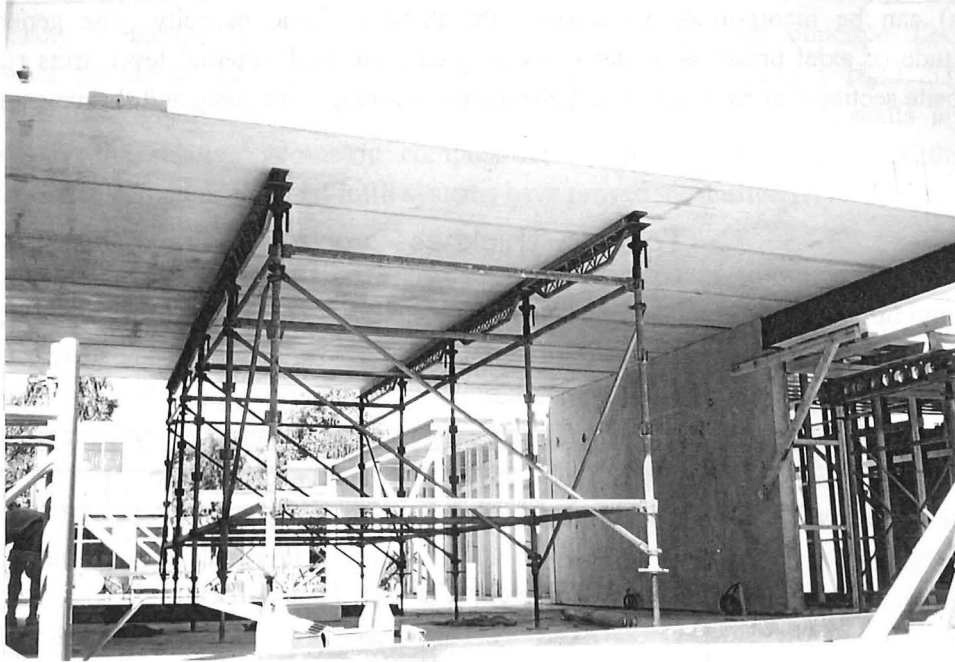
Temporary shoring of a suspended floor constructed from flat slabs
